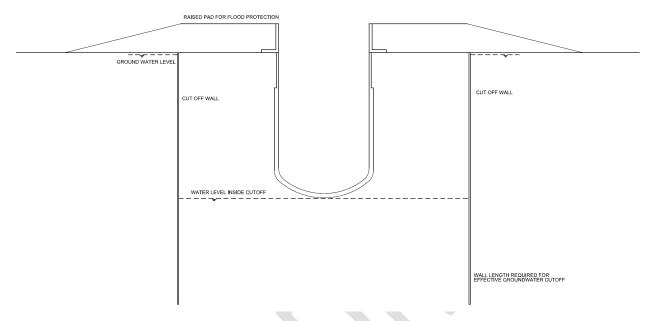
Typical Cross section of Dry Excavation Method with Separate Cutoff Walls
